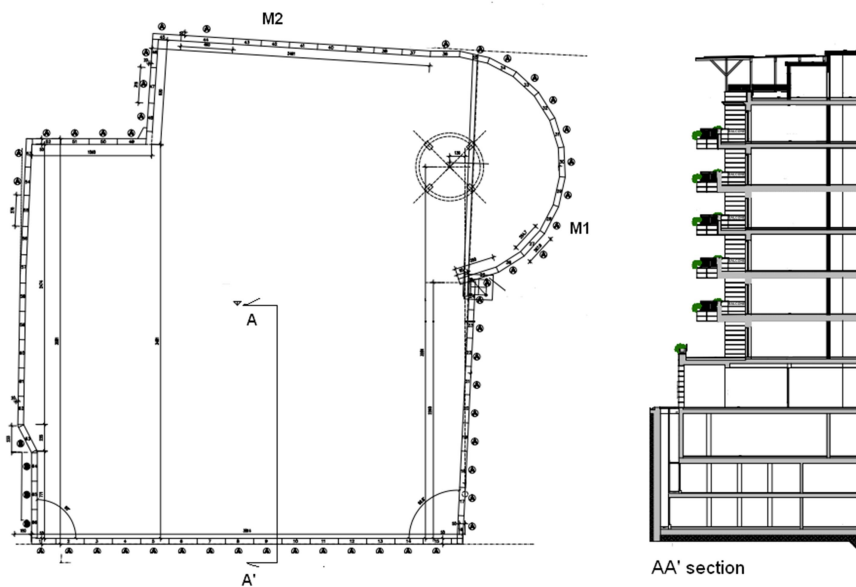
Left: Building underground storey layout showing the diaphragm wall panels along the perimeter, right: side view of the building along AA' section
